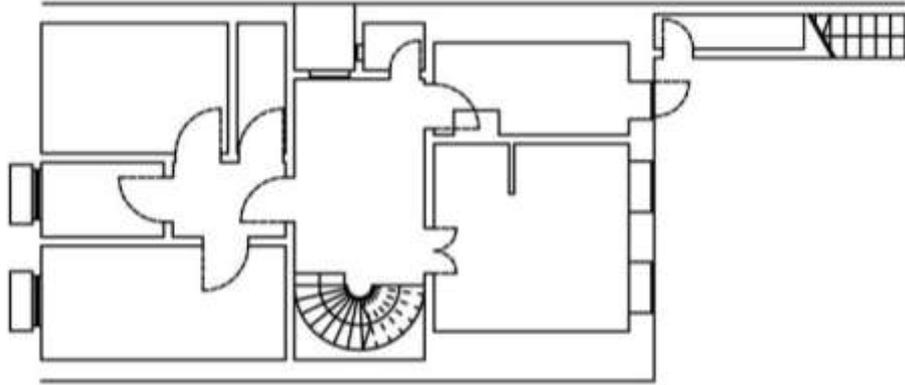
Basement floor plan of the house at 117 lot 6 parcel
